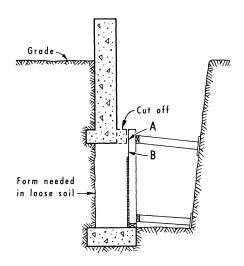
When you extend a foundation, leave out the top boards of the form (at point B) until the concrete reaches the top of the highest board already in place; then put the top boards in place and pour the rest of the concrete. It may be necessary to mix this last concrete as a soft mortar and pour it through an opening (A) chiseled in the old footing.
